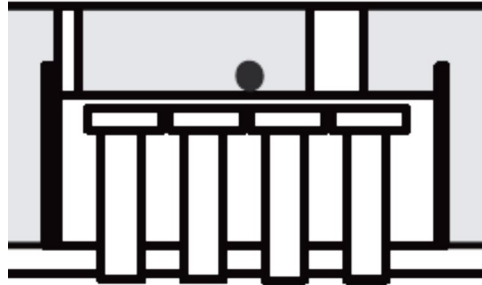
Headed Stud Horizontal Shear Reinforcement (Badie and Tadros, 2008)
